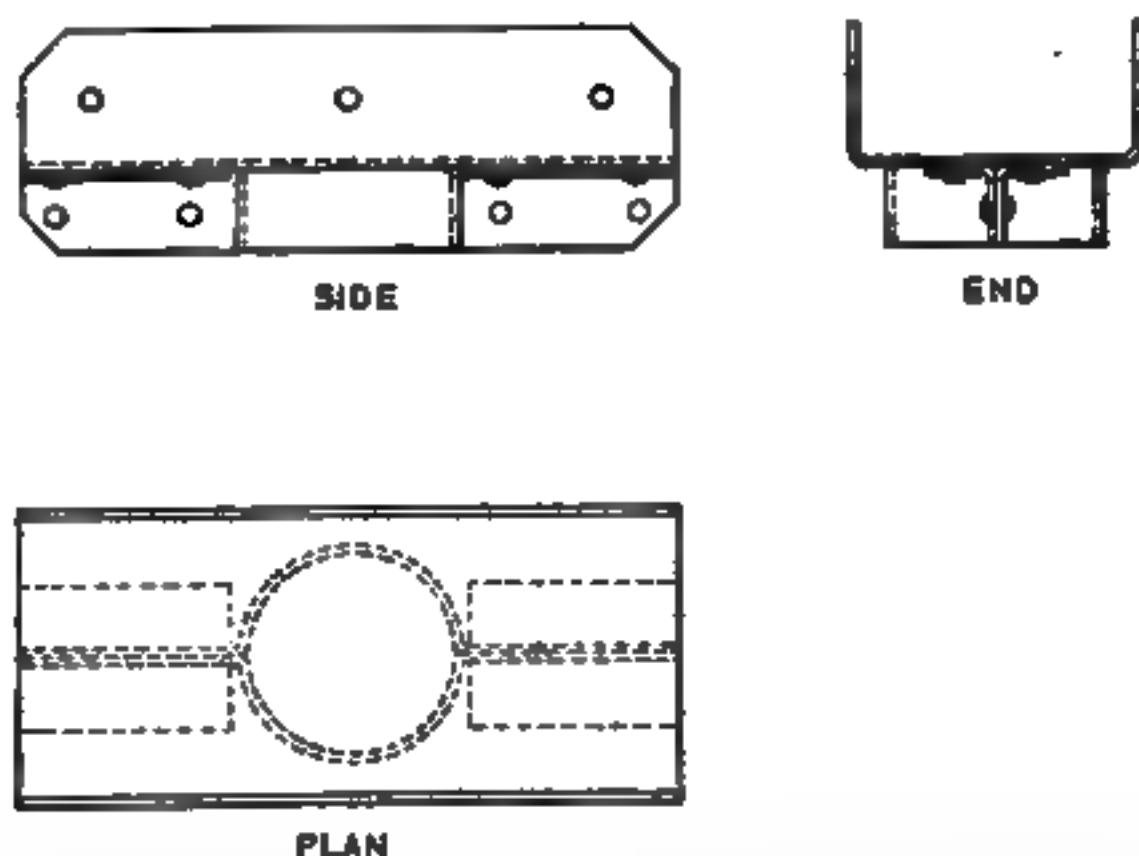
Steel Post-cap for Cylindrical Wooden Post. Elevations and Plan
